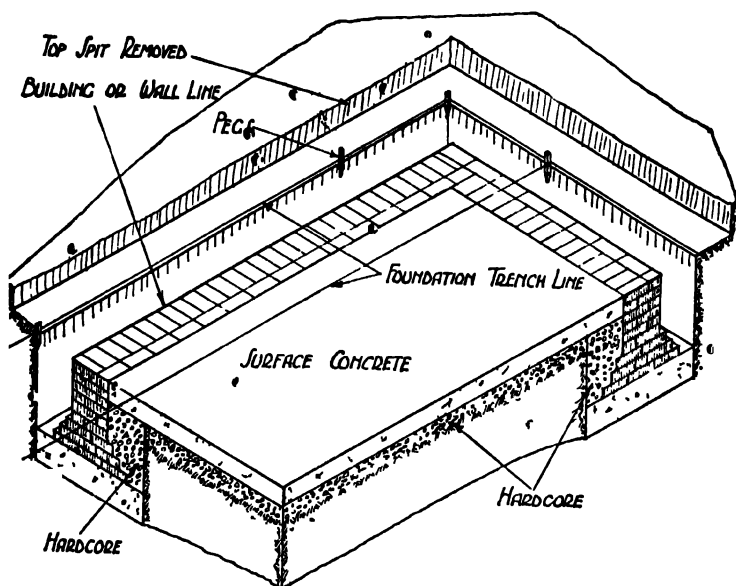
SITE & FOUNDATION TRENCH EXCAVATION
